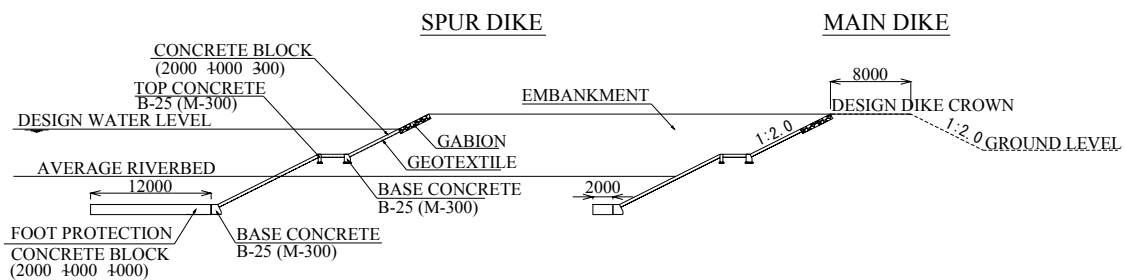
Typical Cross Sections of Spur Dike
